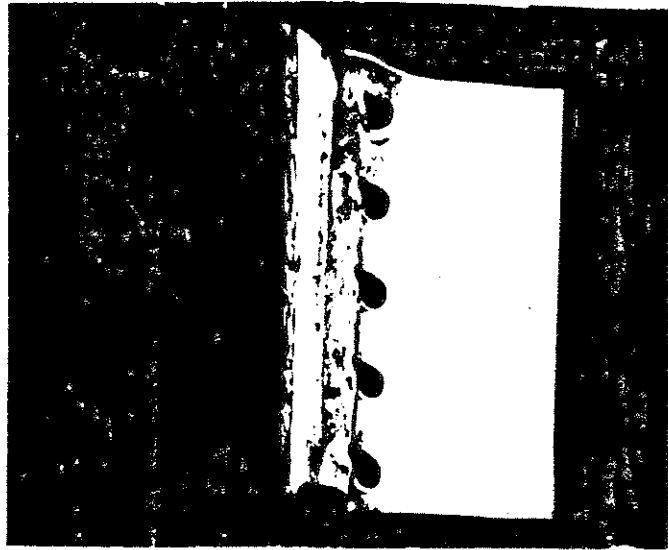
Failure of Net Section of Stem of A Tee Connection (Ref. 3)
